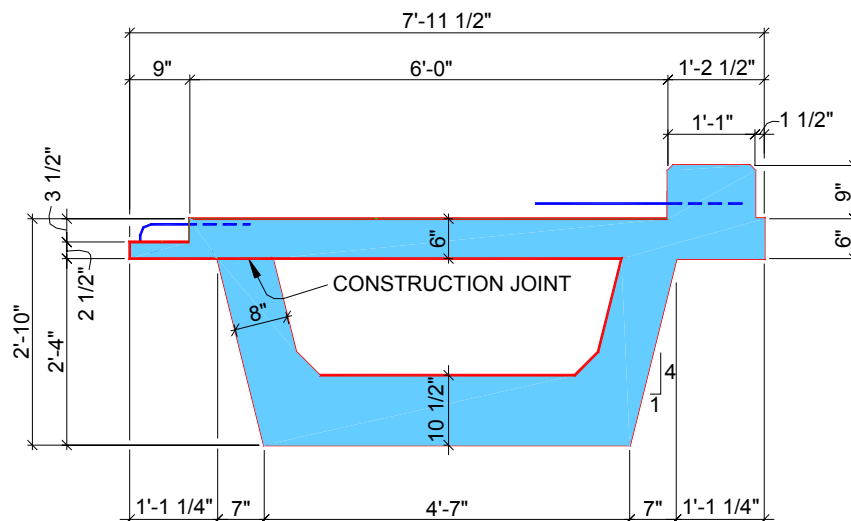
Section of Typical Exterior “Pre-topped U-beam”
